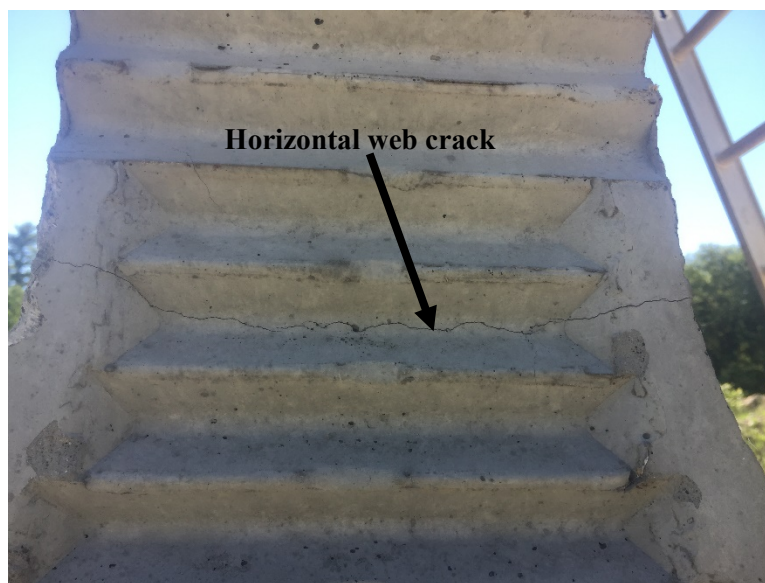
Horizontal end-zone web cracking of a Northeast Bulb Tee (NEBT) girder
